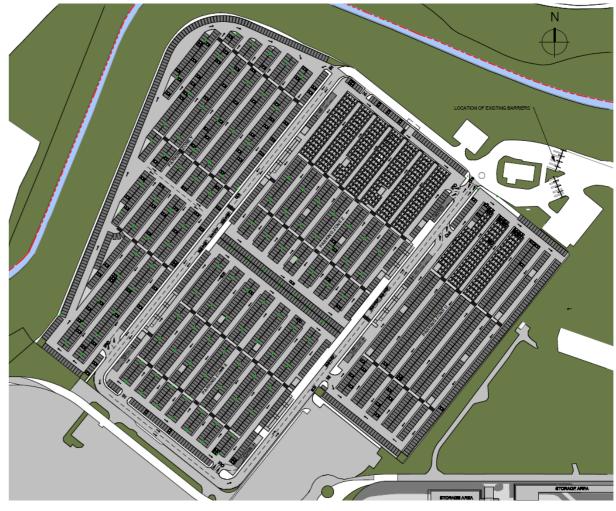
North Terminal Long Stay Car Park Indicative Ground Floor Plan
